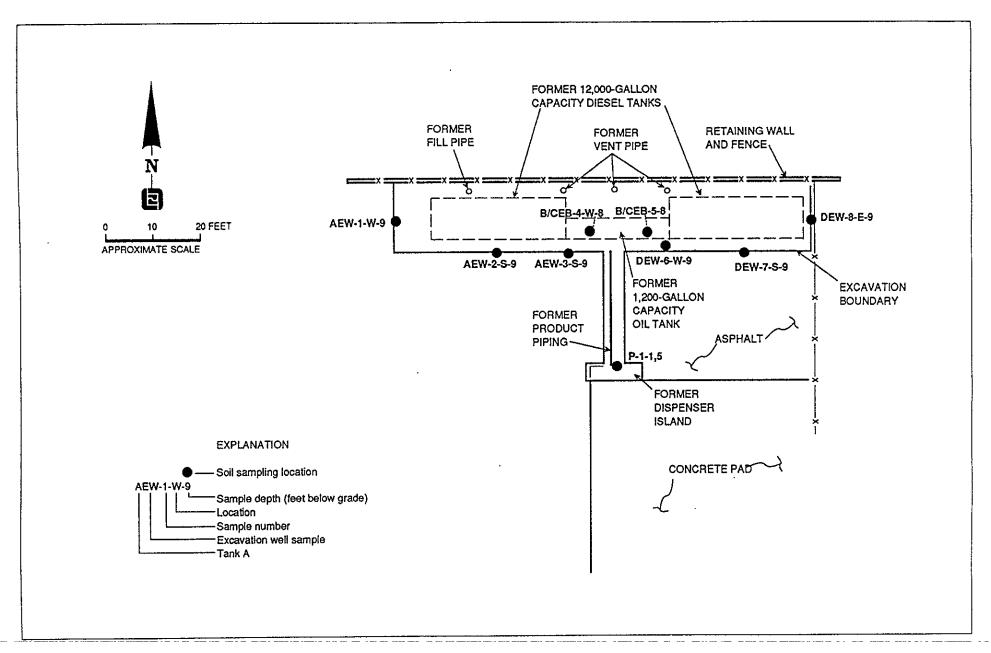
SITE PLAN SHOWING FORMER TANK AND SOIL SAMPLING LOCATIONS AND EXCAVATION BOUNDARIES
